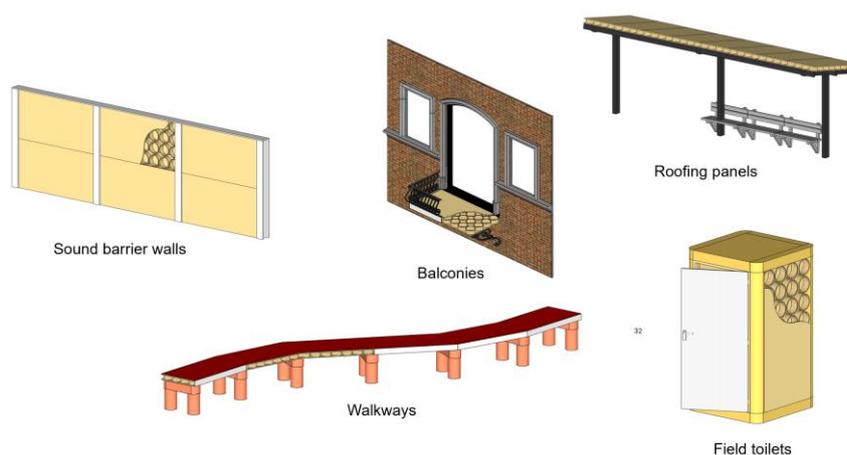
Potential other application where the sandwich panel developed in the REICNA project can be used
